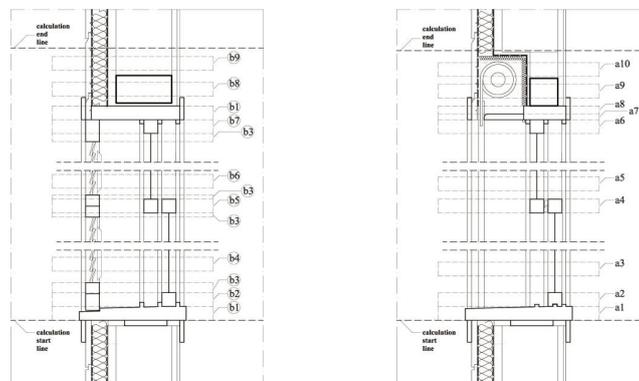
(left) section of the window of the reconstructions with wooden shutters; (right) section of the window of the reconstructions with aluminium roller shutters (Source: Author).
